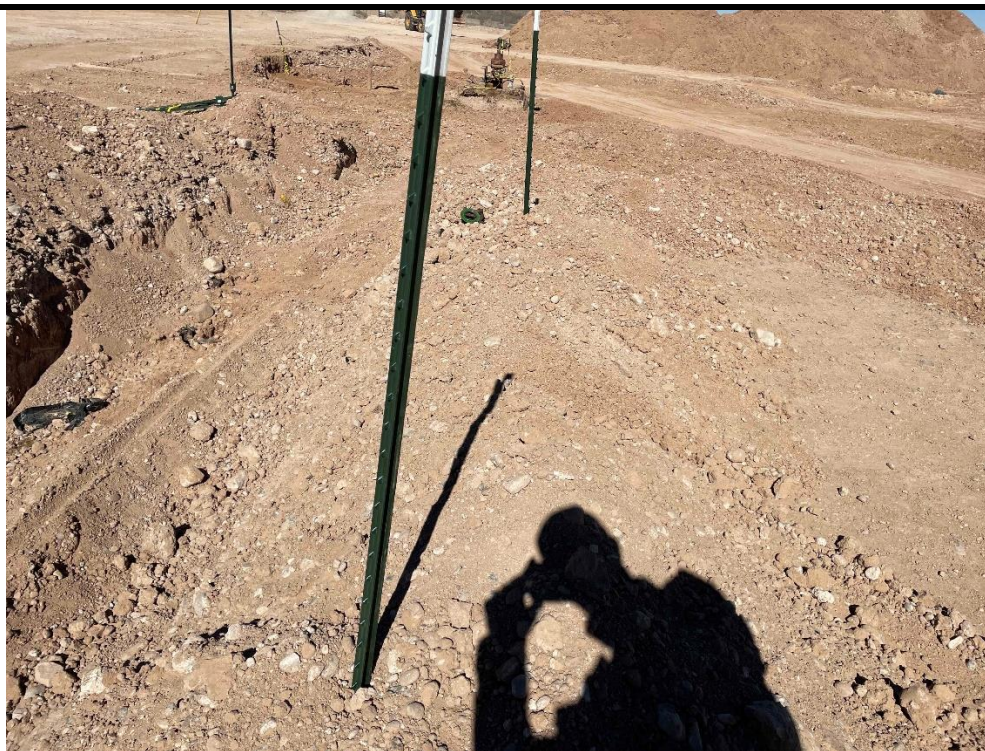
View of the excavated area and tank battery, facing northwest. 04/09/2021
